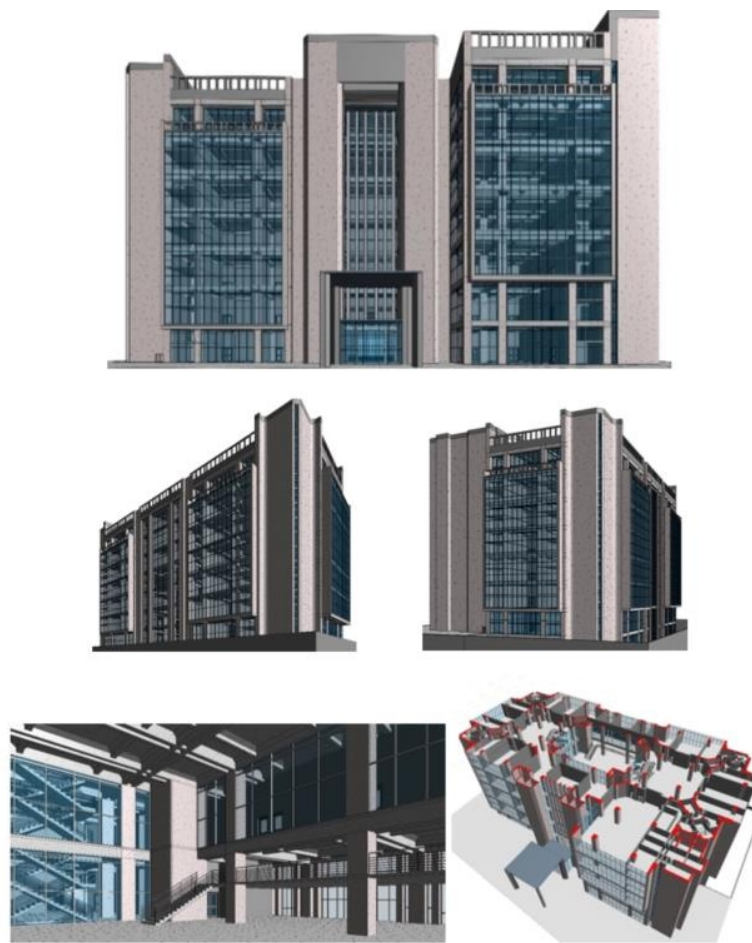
MSGSU Bomonti building architectural and structural As-Built BIM models
